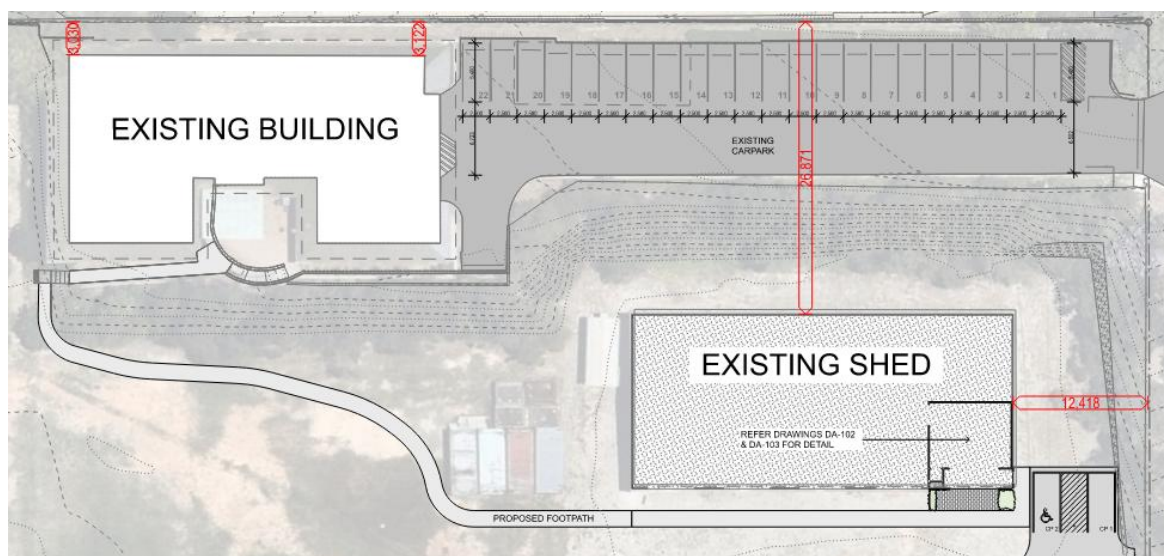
Proposed Sales Office and pedestrian connection with car parking area
